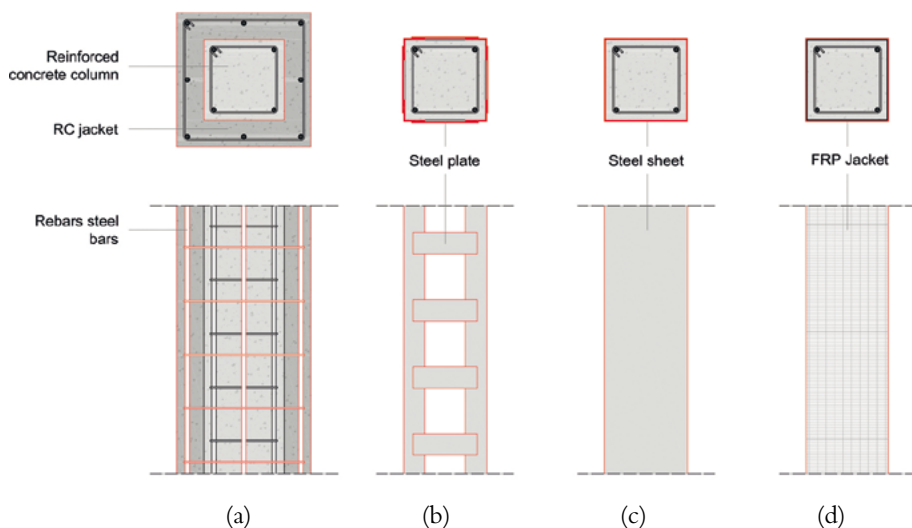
Systems for improving the deformation capacity by additional confinement: a) Reinforced concrete jacket; b) Steel jacket; c) Continuous steel jacket; d) FRP jacket.
